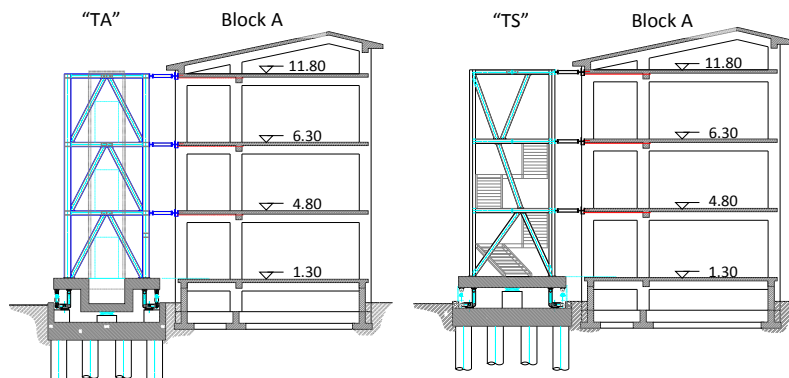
Sectional elevations of block A with dissipative towers in the transverse direction
